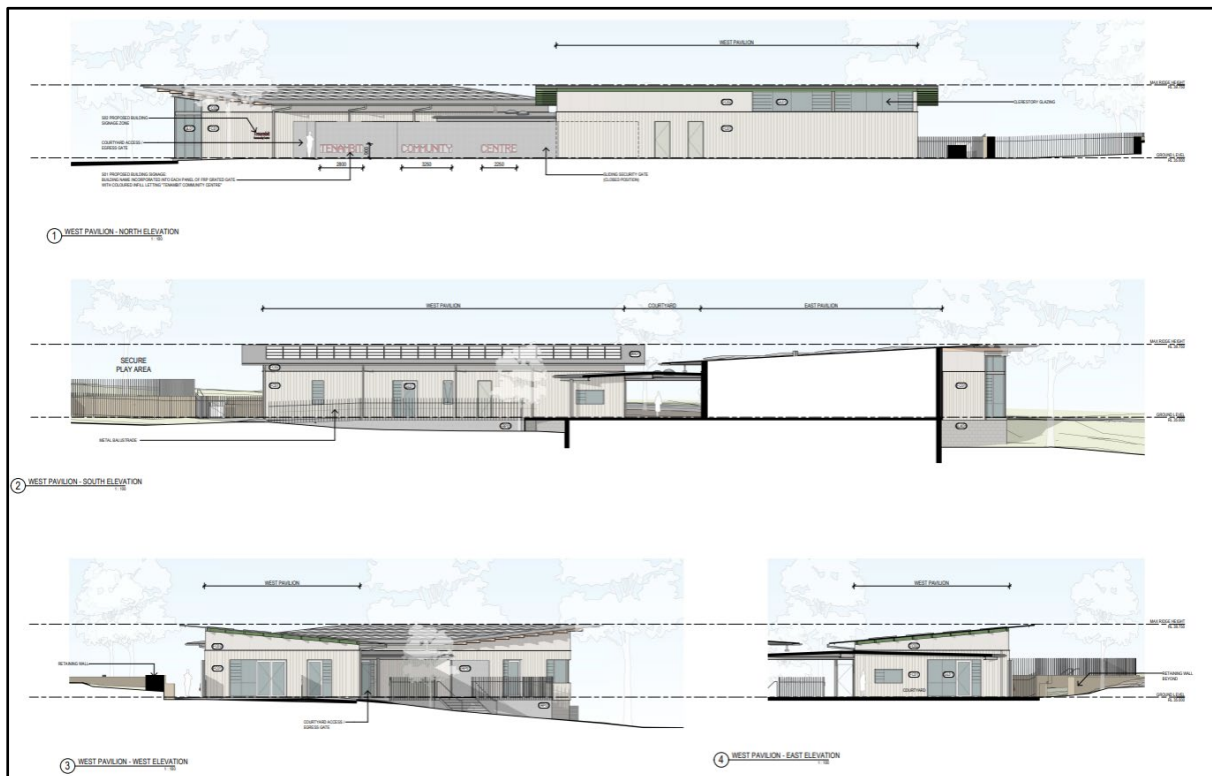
Elevations - West Pavilion. Source: AJC Architects dated 23 April 2024.
